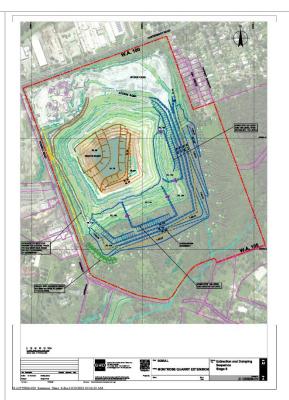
Proposed Expanded Pit – Stage 6 (source GHD)
